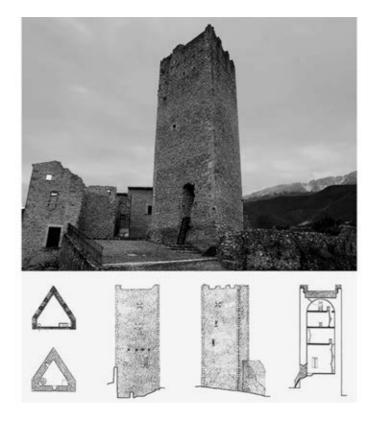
Triangular tower of Beffi, Acciano. View, plans, elevations and section taken from the survey. [Lab. of History, Department of Architecture, Unich]
